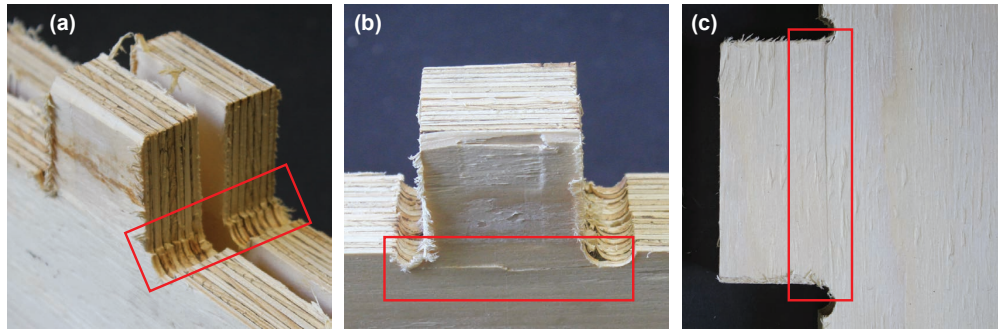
Failure photographs of T2 specimens: (a) Axonometry (b) Front view T2-50 (c) Front view T2-100.
